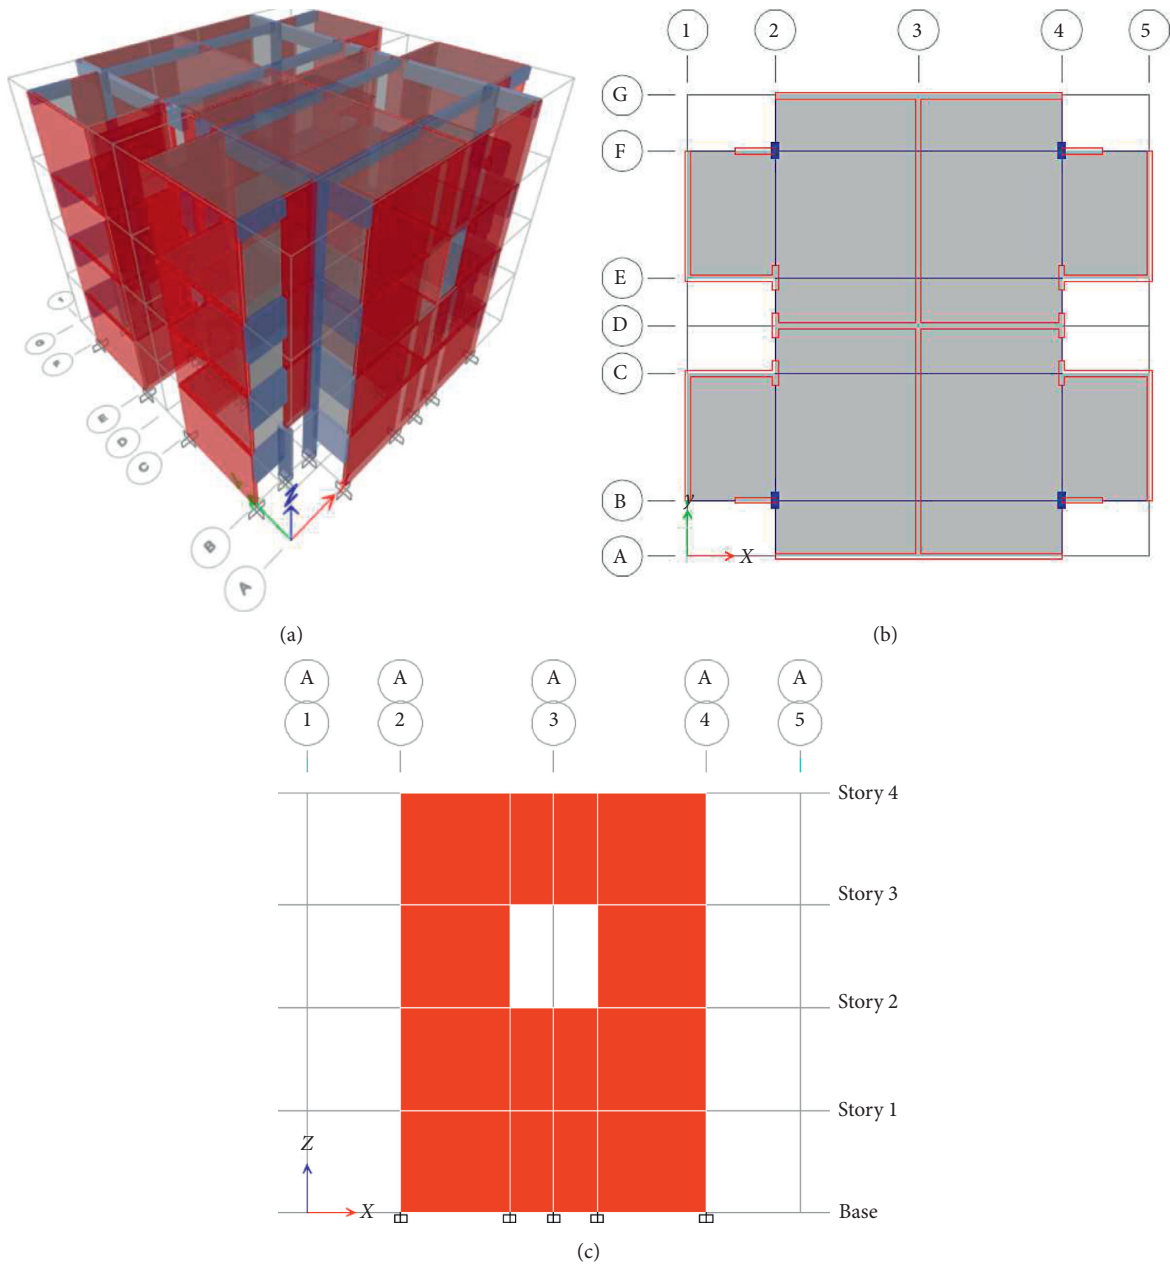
Low-rise RC building model for numerical analysis: (a) 3D view, (b) typical floor layout, and (c) elevation A1-5.
